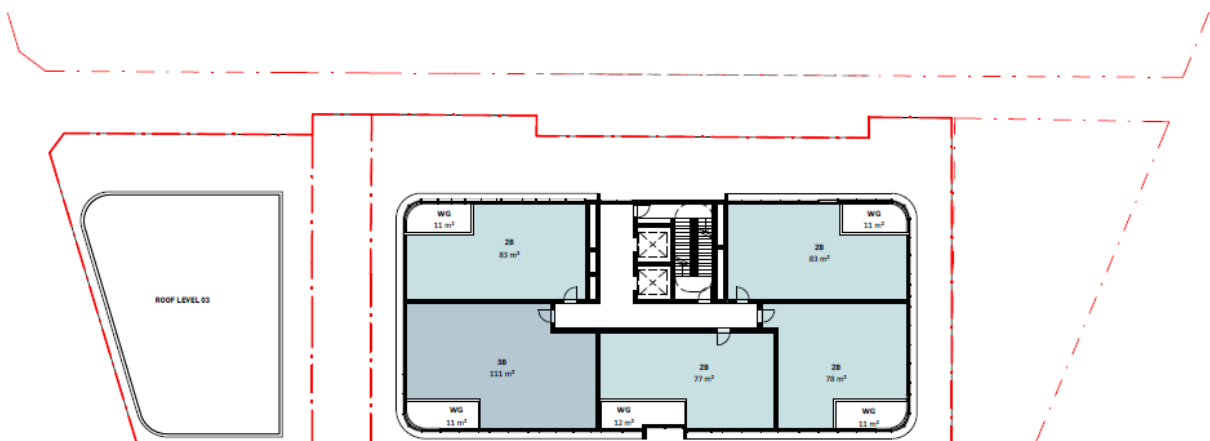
Concept Reference Scheme – Level 1 - 6 Floor Plans
